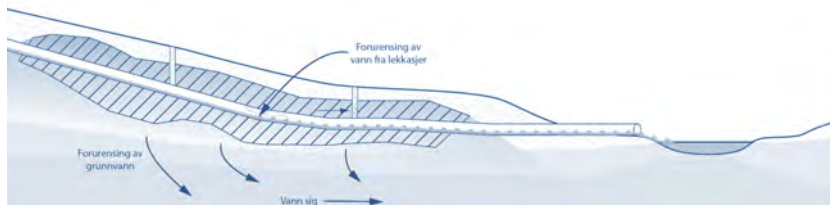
Sectional illustration of the vertical manholes imbedded in the unstable masses of the landfill, which are suffering from the lateral movement. Because of the poor condition of the cracking pipe system, leakage water can enter the pipe through which the creek Kjorbekk flows. The section also shows the challenge with the landfill close to the larger Skien River, as groundwater might flush the pollution into the water streams. Ill: Worksonland.
